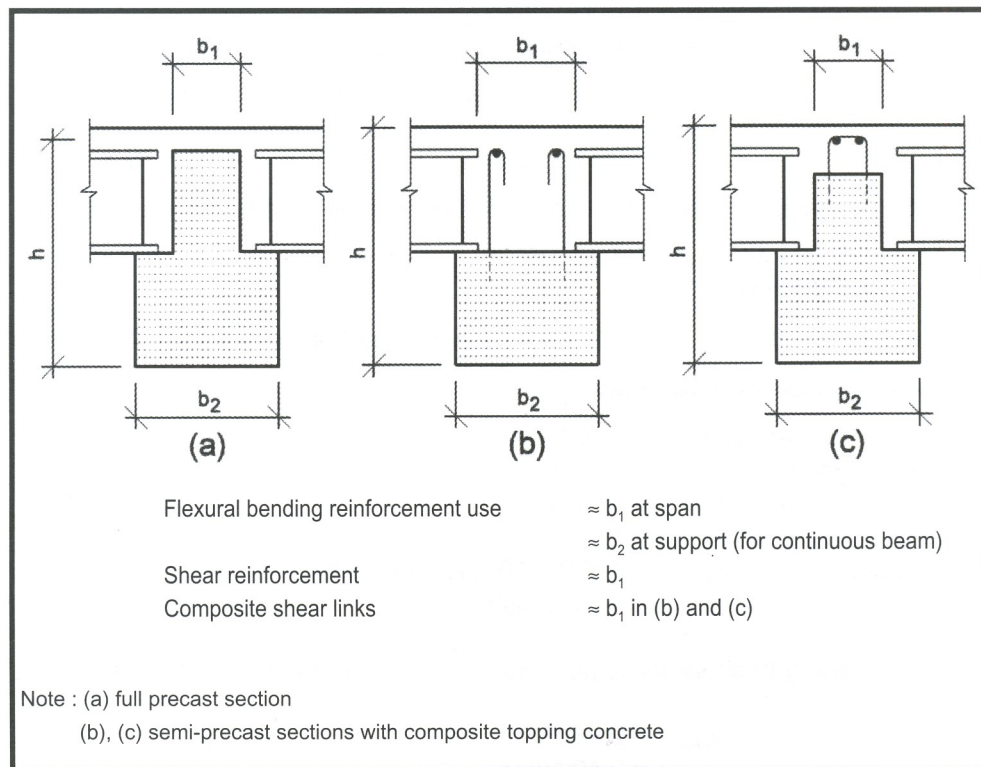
Effective Widths And Depths In Precast Beams Design
